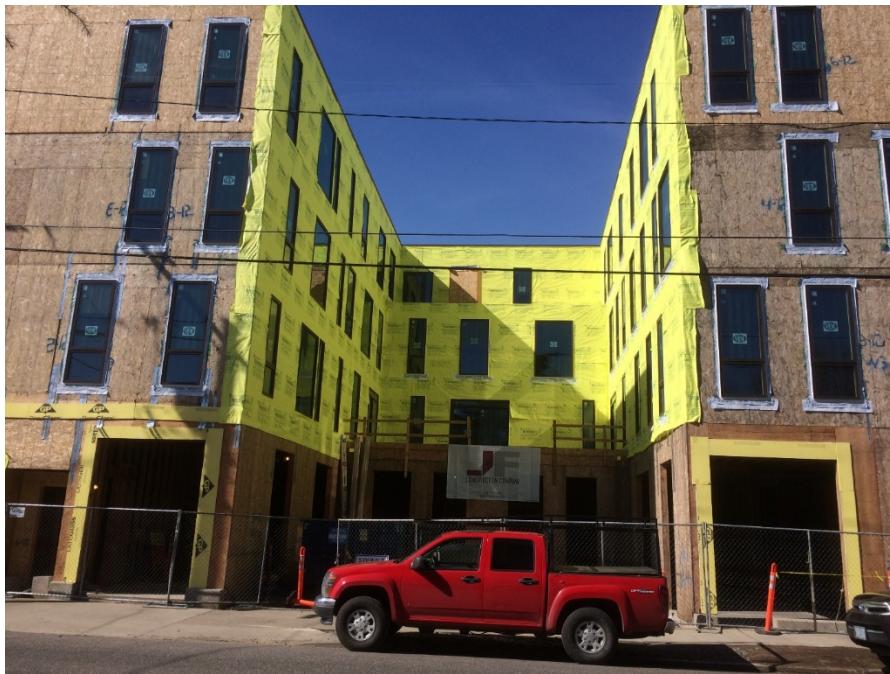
A private outdoor courtyard with surrounding building on 4 sides, adjacent building above not shown and no photo possible. Standard QR8 would provide points for a space hidden from the public. 8222 SE 6th Ave.
